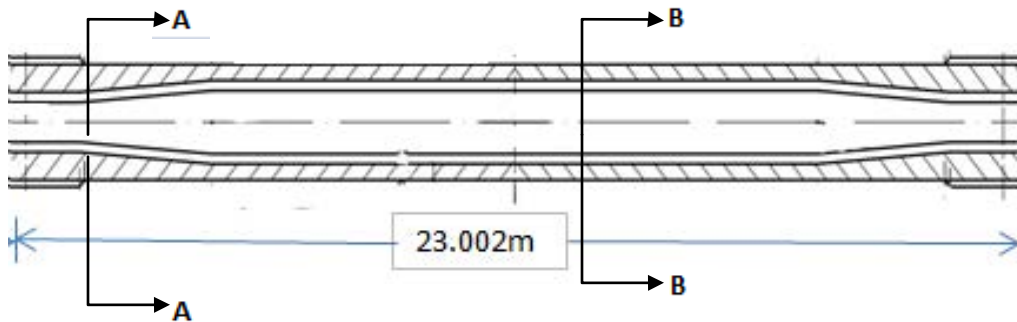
the longitudinal cross-section of the 20m simply supported box-girder
